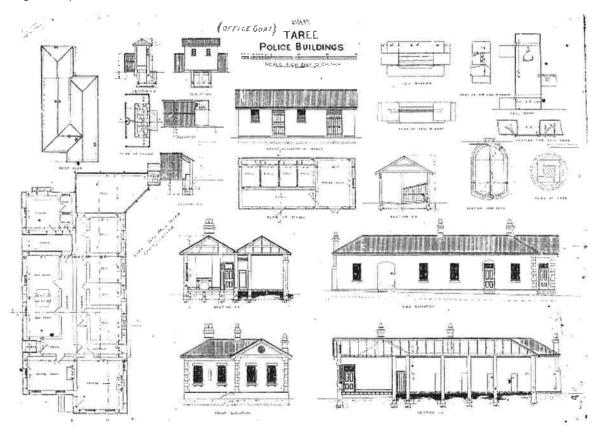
Plans for Taree Police Buildings, 1884. The small brick building housed a lockup keeper's residence as well as charge room, four cells and exercise yards for prisoners. The stables, water cistern and privy facilities are also shown. (Source: Plan Services, Department of Finance)
